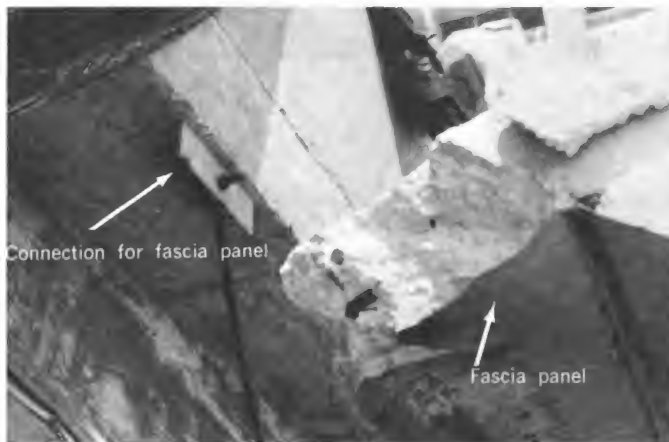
Olive View Hospital, medical treatment and care unit. Shift of southwest corner of east elevator at first-floor level. Wall was designed to be nonparticipating in resisting lateral loads and was separated from floor framing at this level.
